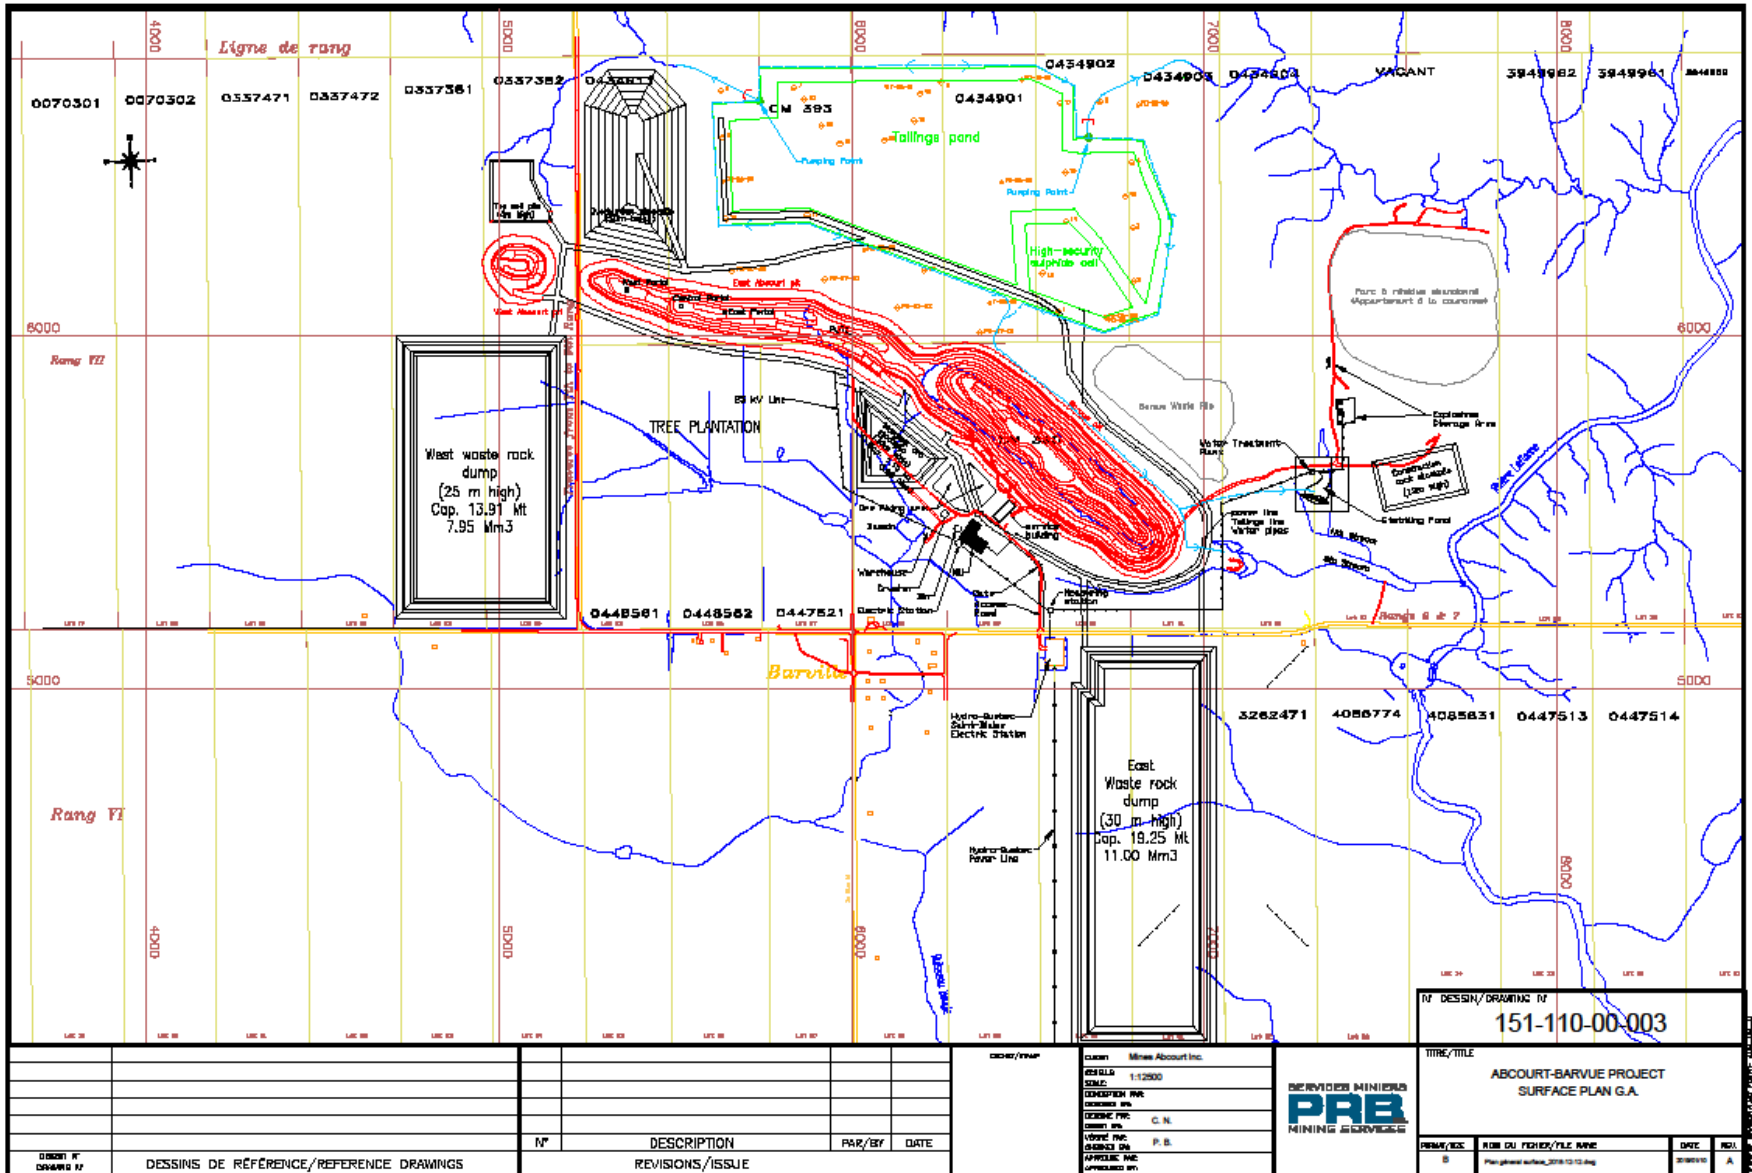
Abcourt-Barvue Mine Site Plan View
